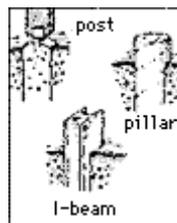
You can minimize damage to trees near foundations by using posts, pillars, or I-beams rather than foundation walls.
